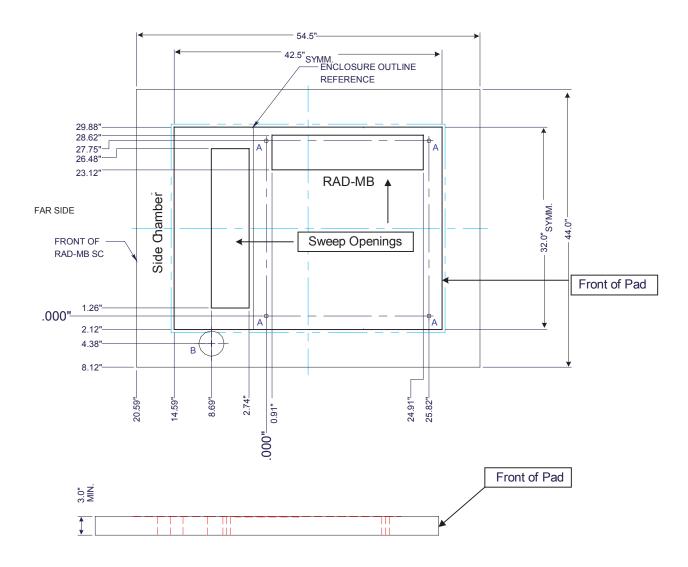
, Precast Pad Dimensions for Single Enclosure with Side Chamber (P/N 641-114-10)
